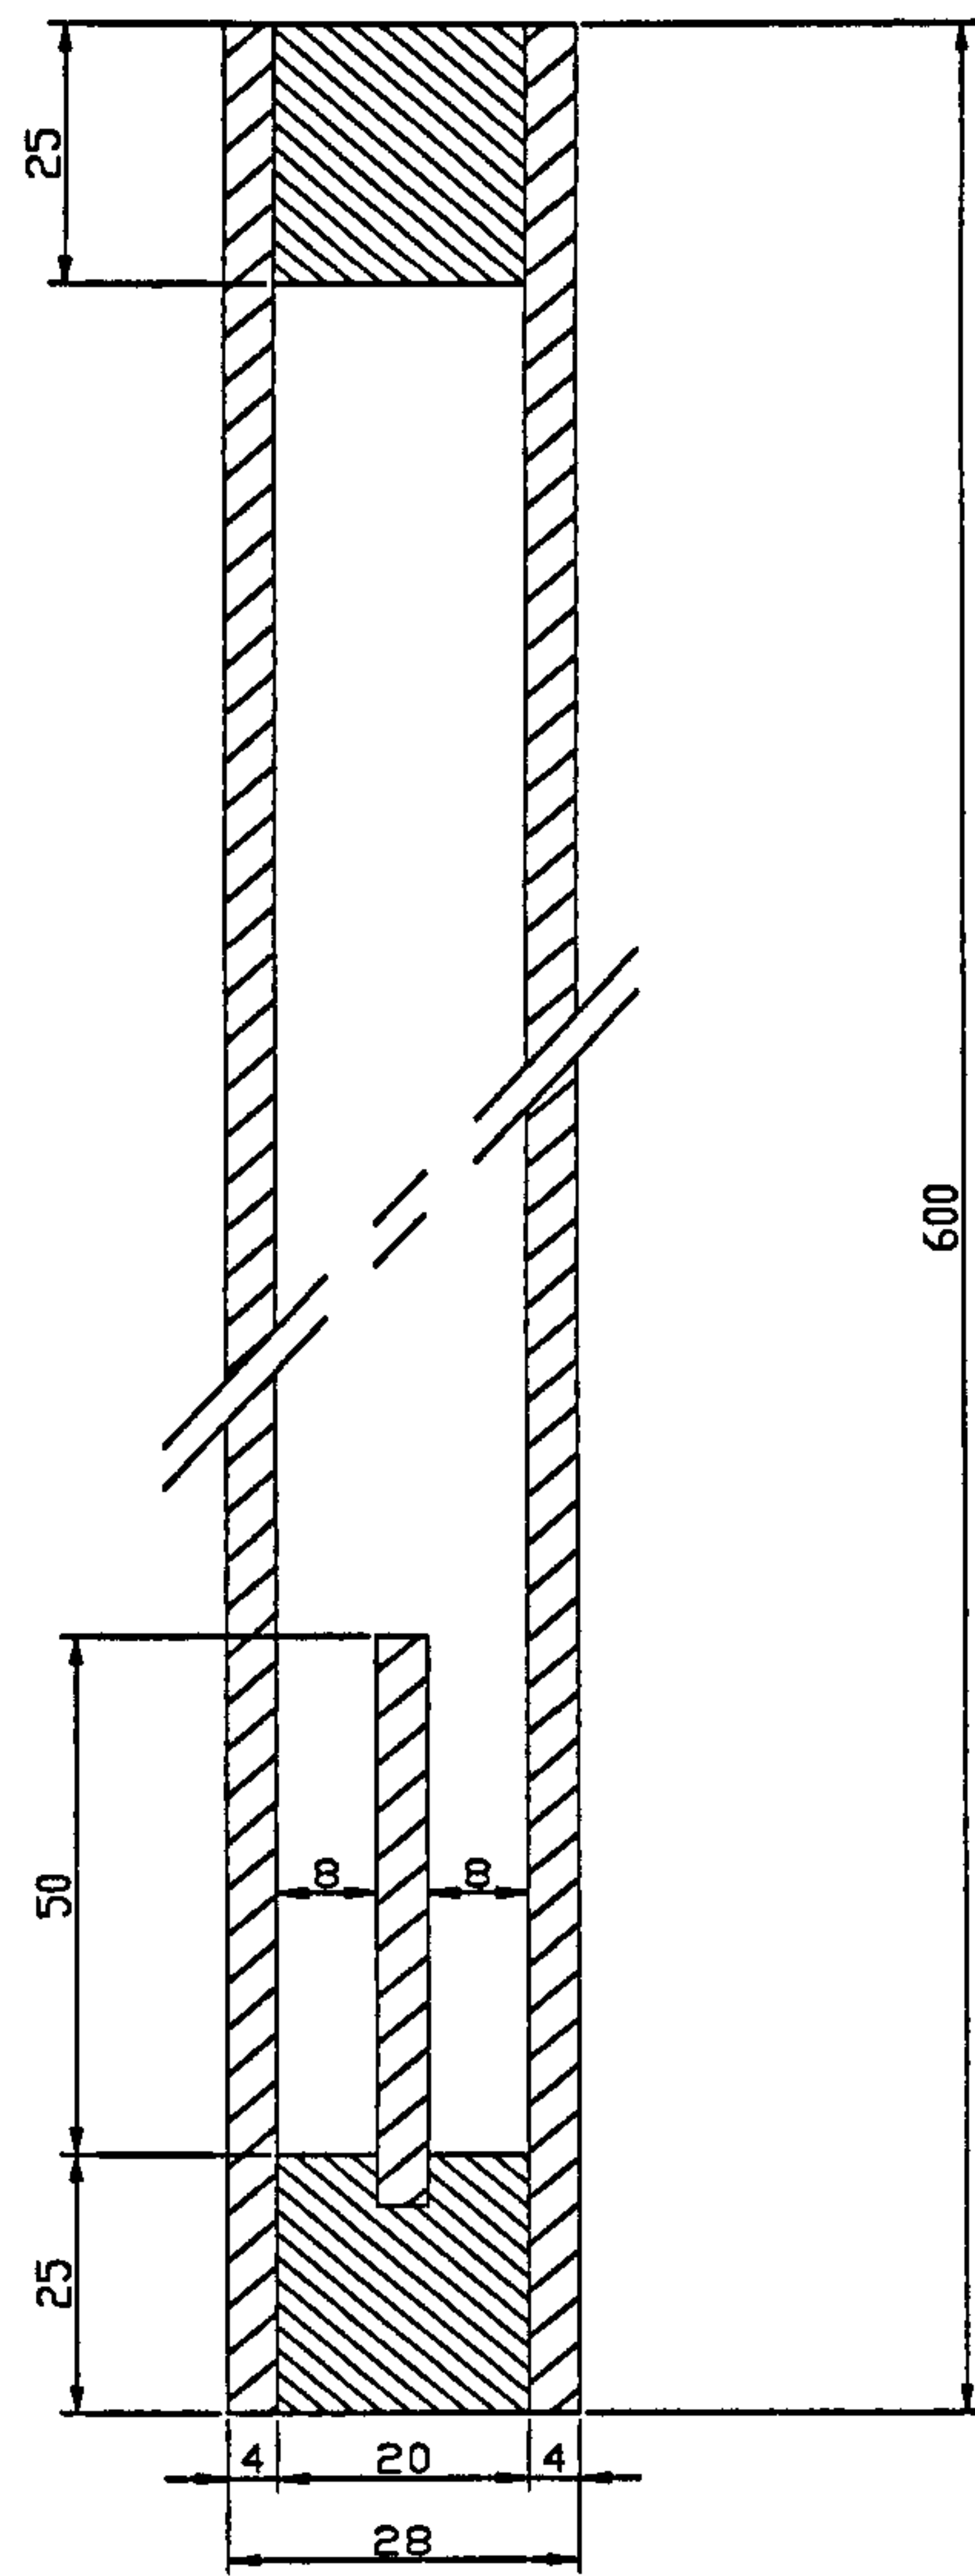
The cross section of a window with a 50mm high baffle plate.
